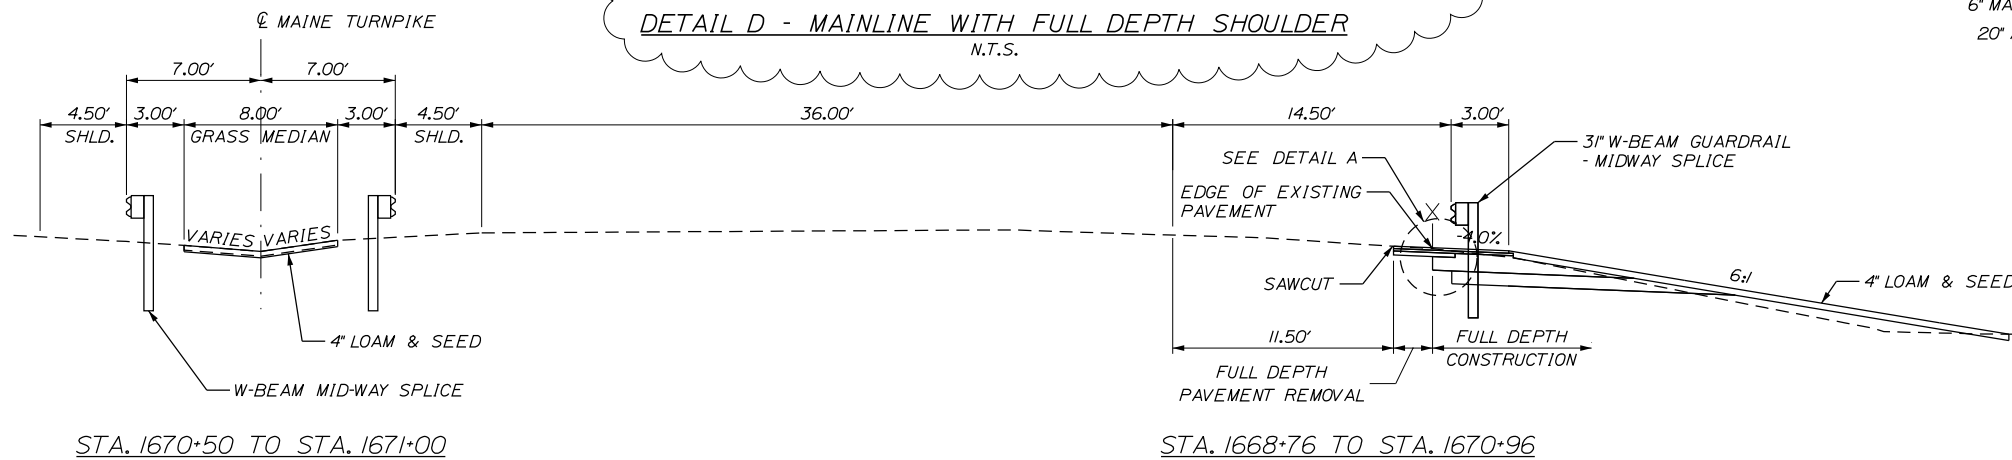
DETAIL D - MAINLINE WITH FULL DEPTH SHOULDER
